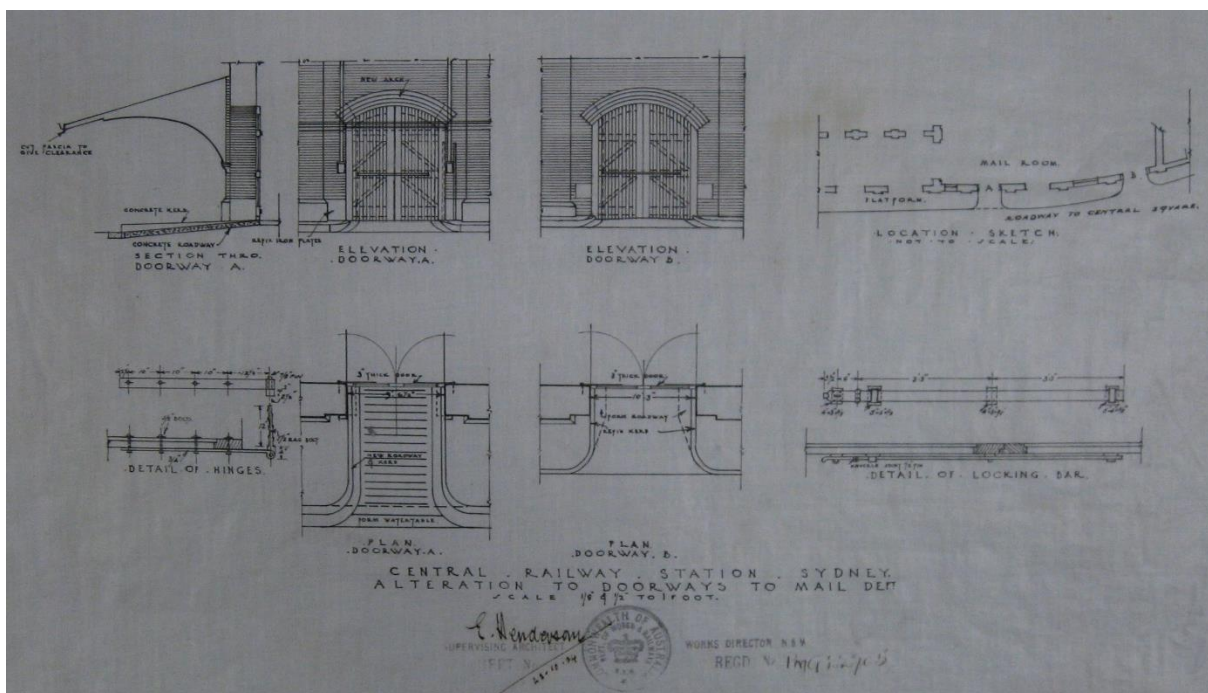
Central Railway Station Sydney, alteration to doorways to mail department, 1925. Plans signed by E Henderson, Supervising Architect
